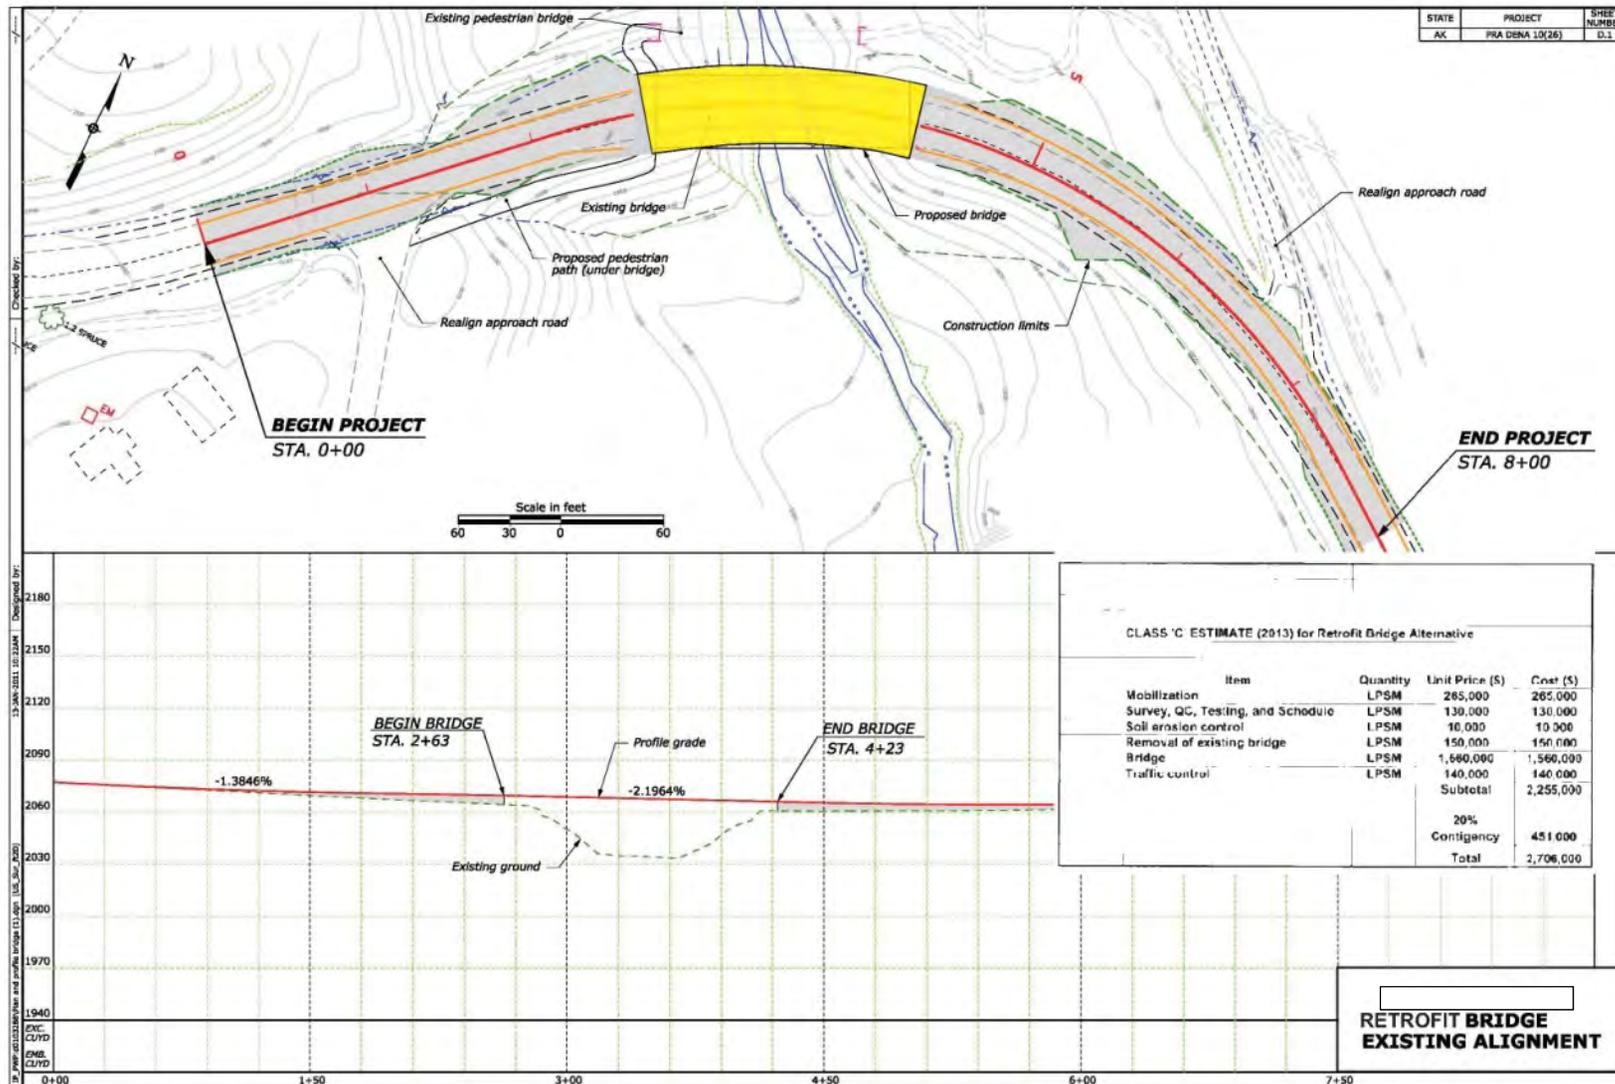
Alternative 3: Retrofit Bridge, Existing Alignment
